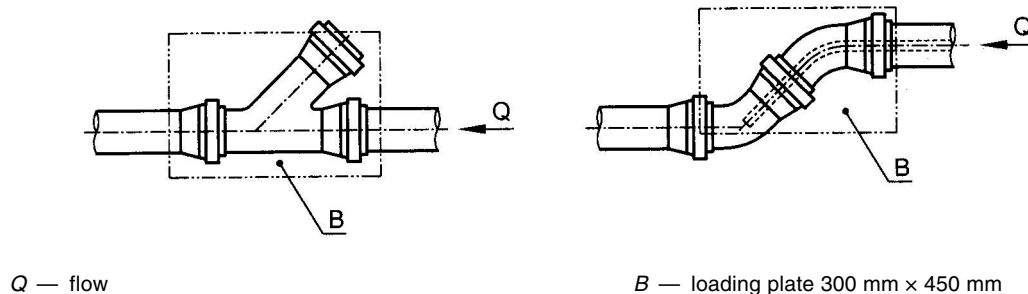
EXAMPLE OF POSITIONING OF A TEST PIECE UNDER THE LOADING PLATE
